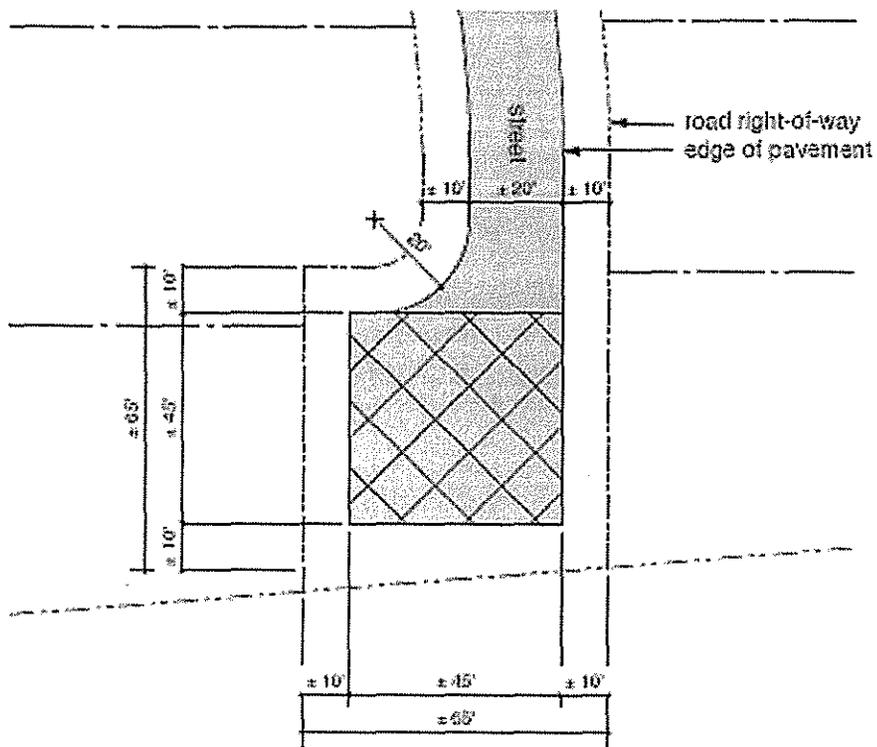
Street Intersection Angles and Radius Variance Request - Subdivision Control Code
